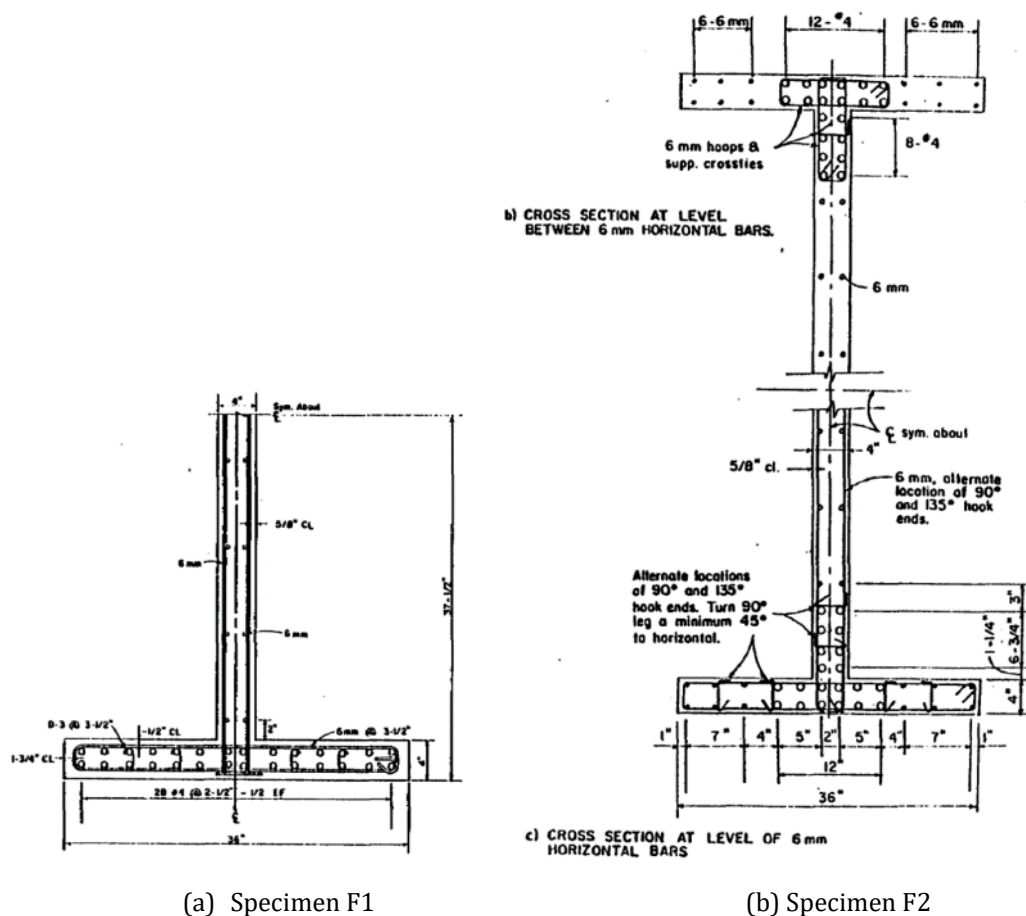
Test Specimen Geometry and Reinforcement Details for Oesterle et al. [140, 141]
